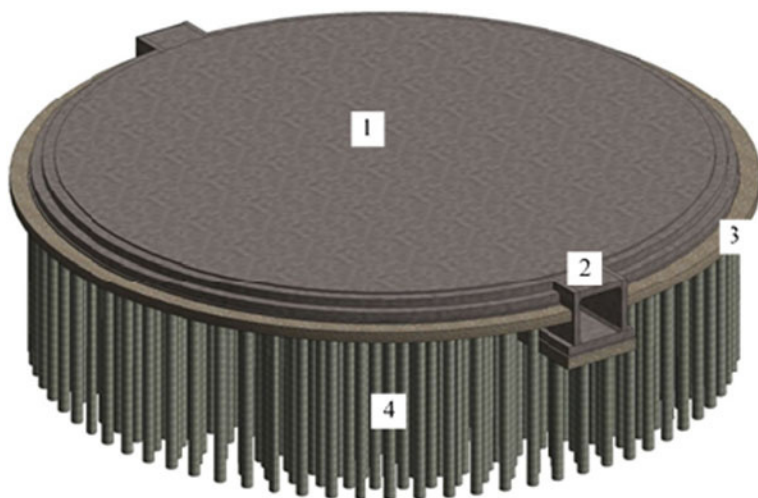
Structural layout of the foundations of grain storage silos on a reinforced basis: 1–foundation slab; 2–underground gallery; 3–damping layer of crushed stone; 4–soil–cement elements
